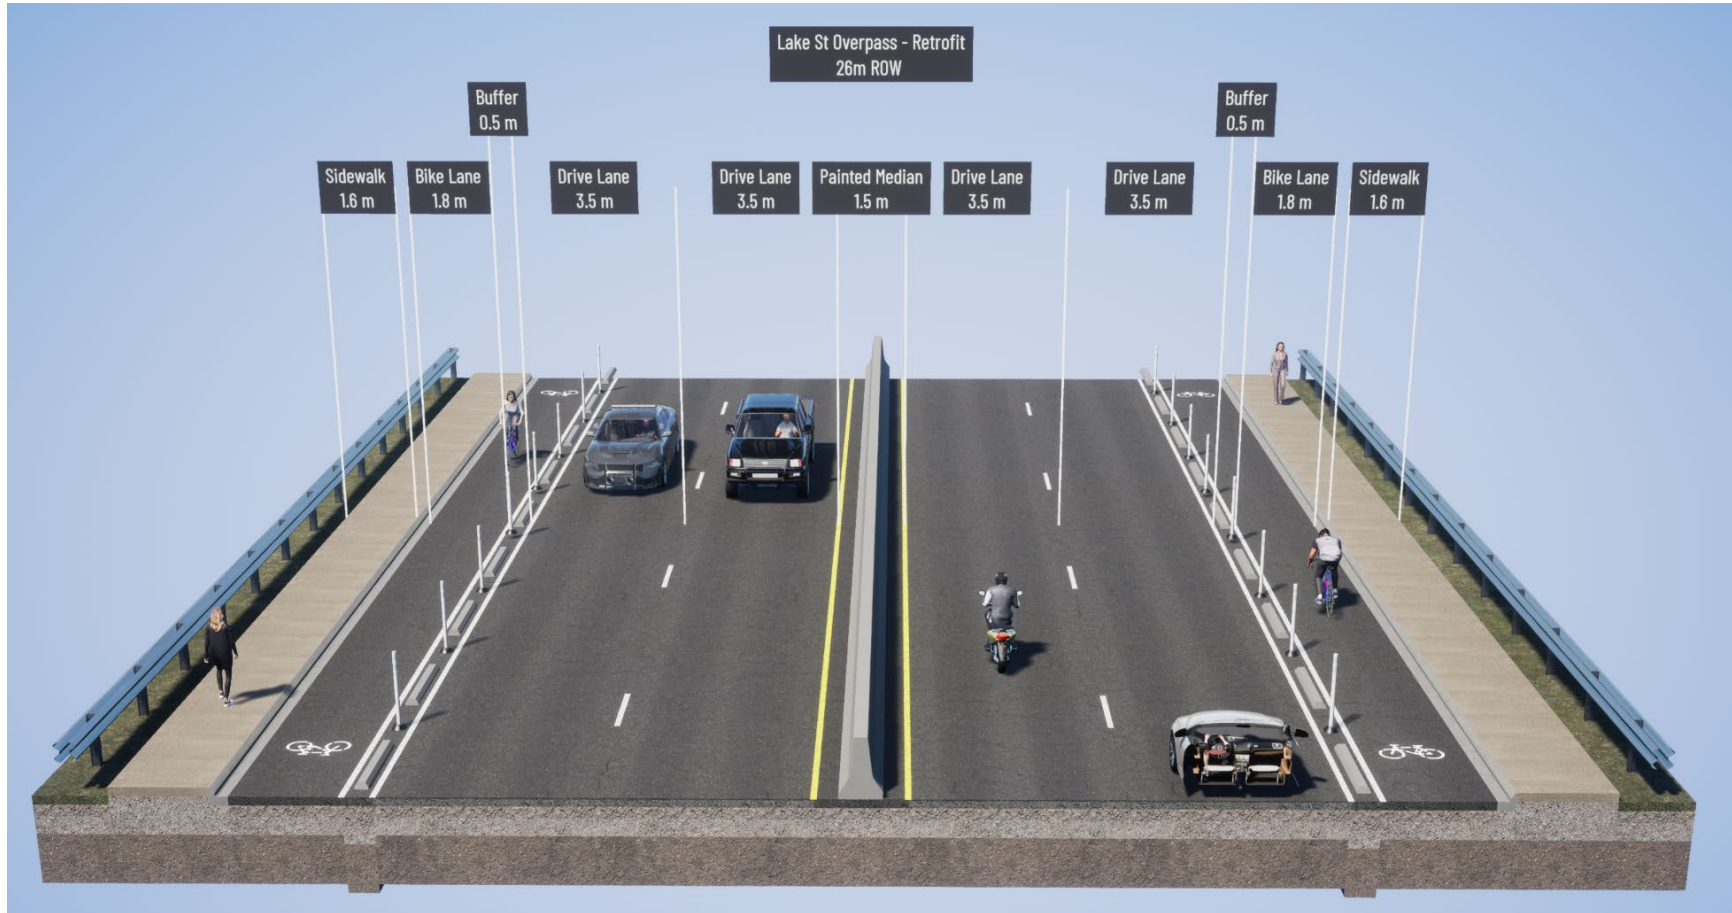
Lake Street QEW Overpass - Retrofit with Protected Bike Lanes
